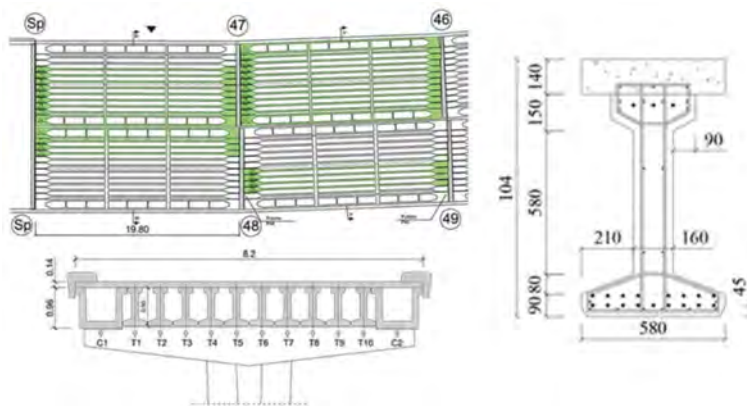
Drawing of the first four decks of the southern part of the viaduct. In green, the beams collected to be tested. On left, the I-shaped beam cross section (measures in mm).
